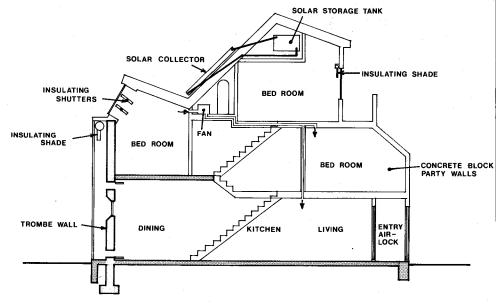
Section through townhouse building, Vancouver, British Columbia. (Architect: Klaus Schmid; Solar Design: Solar Applications & Research Ltd., both of Vancouver, British Columbia.)
